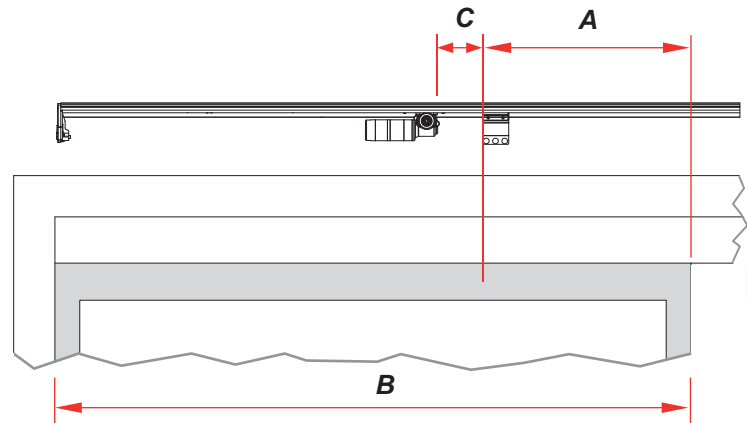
Bi-parting doors: motor and top bracket. The left side is shown with left door open.
